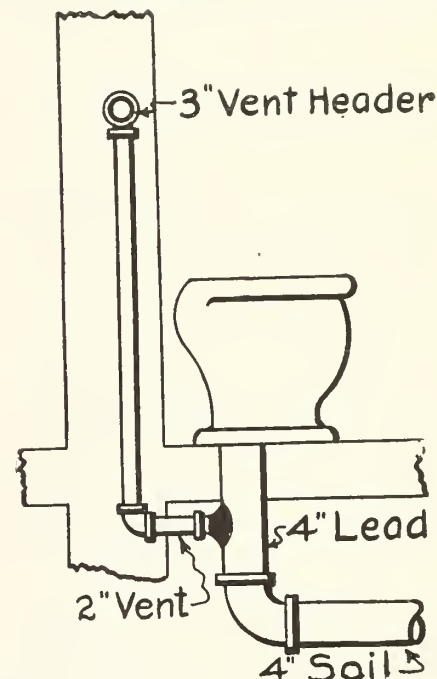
Elevation of Closet in the Æolian Building, Showing Vent and Drain Connections.
